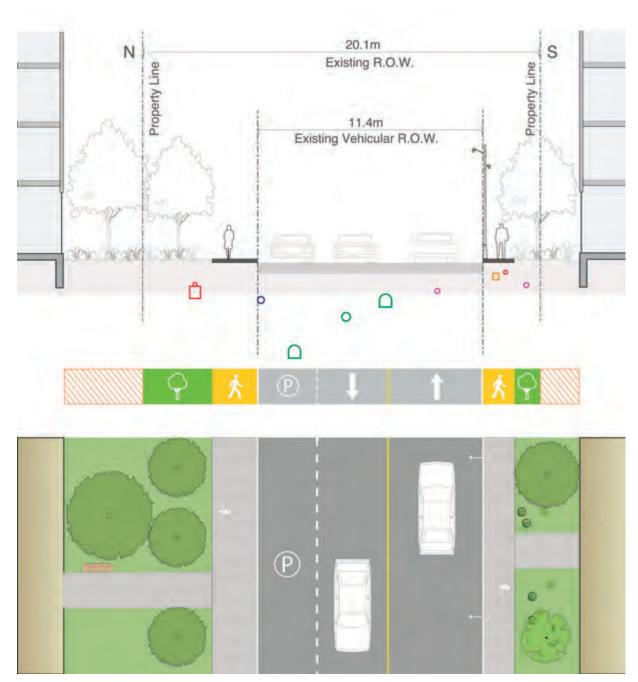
Section and Plan of the Existing Conditions along Merton Street
